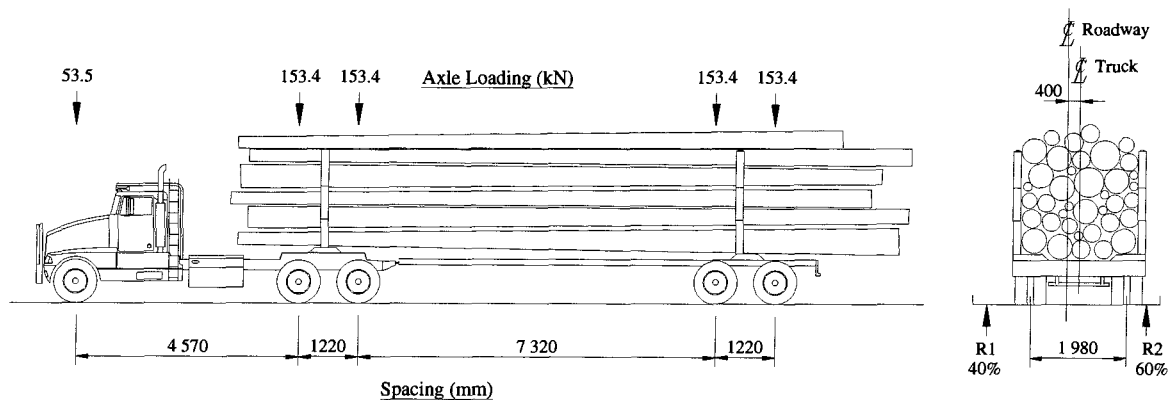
L-75 (Off Highway) Logging Truck Design Load on Forest Road Bridges
